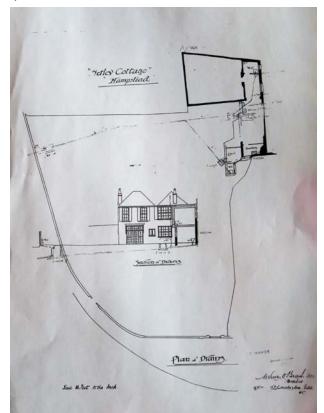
Plan of Netley Cottage in 1908 showing the extent of the garden, a ground floor plan and an elevation of the cottage. Whilst the gate to the path is in an approximately similar position to today, there is an additional opening in the wall to the left. [© Camden Local Studies and Archive Centre, Drainage Plans 3411]
